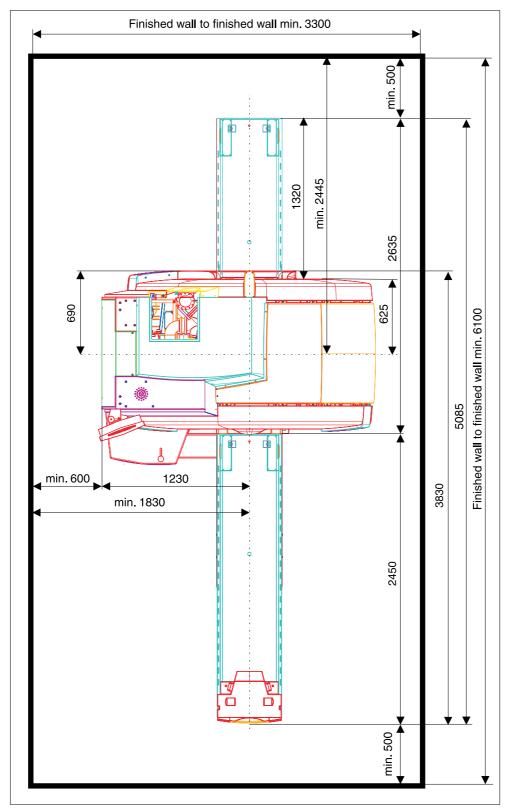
Examination room; minimum technical room size from finished wall to finished wall
